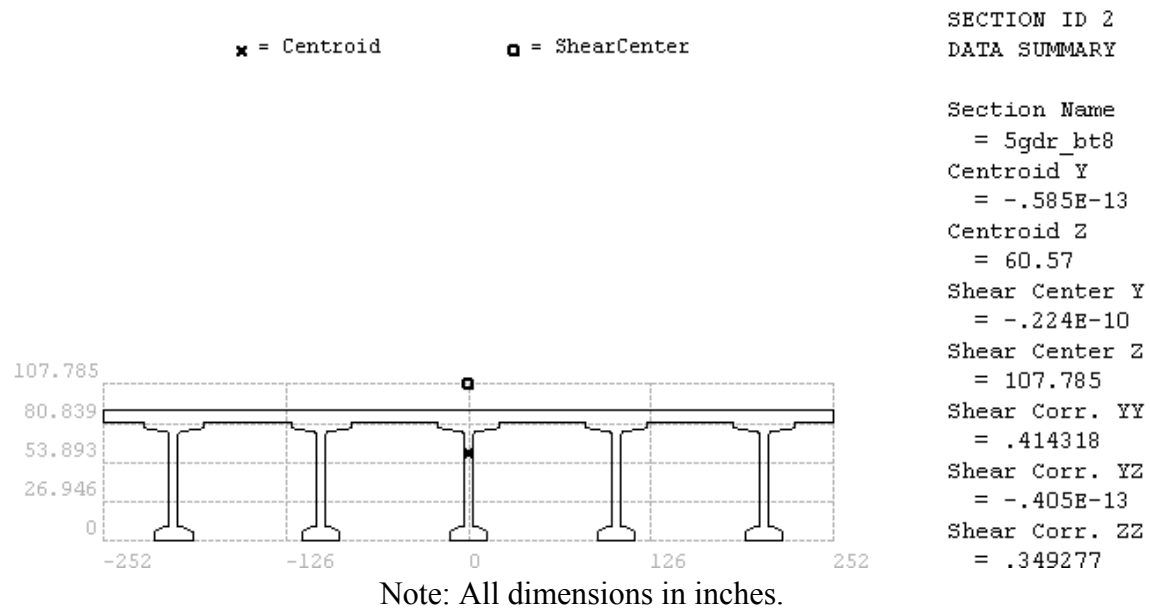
Beam Element (BEAM189) Cross Section for Superstructure
